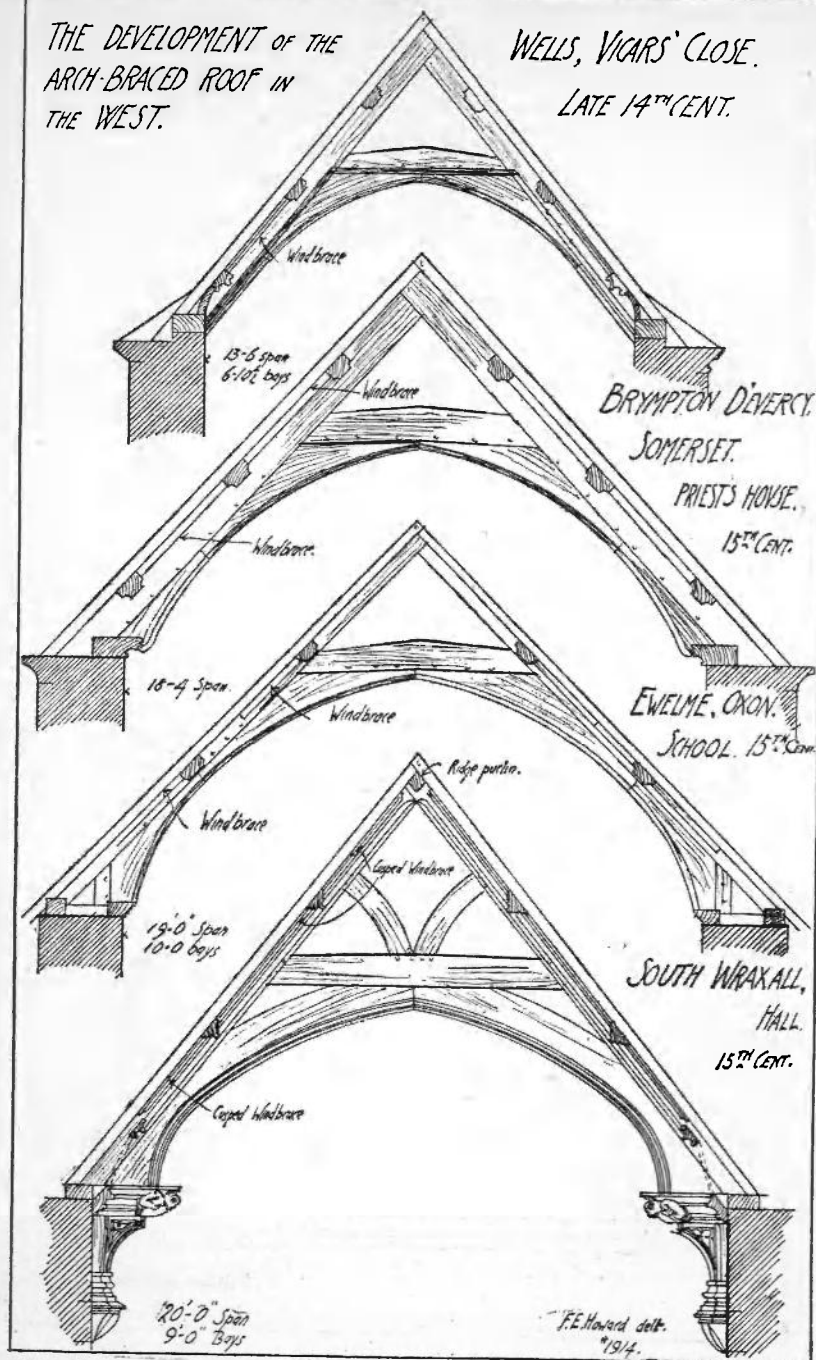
ARCH-BRACED ROOFS, DOUBLE-FRAMED, SHOWING DEVELOPMENT OF THE HAMMER-BEAM.
